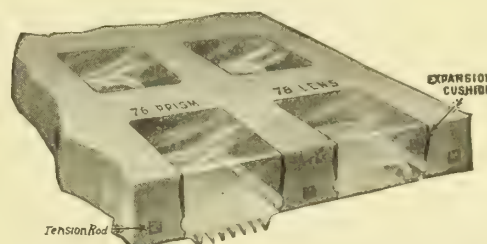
LUXFER CUSHION PROTECTED SIDEWALK LIGHT
